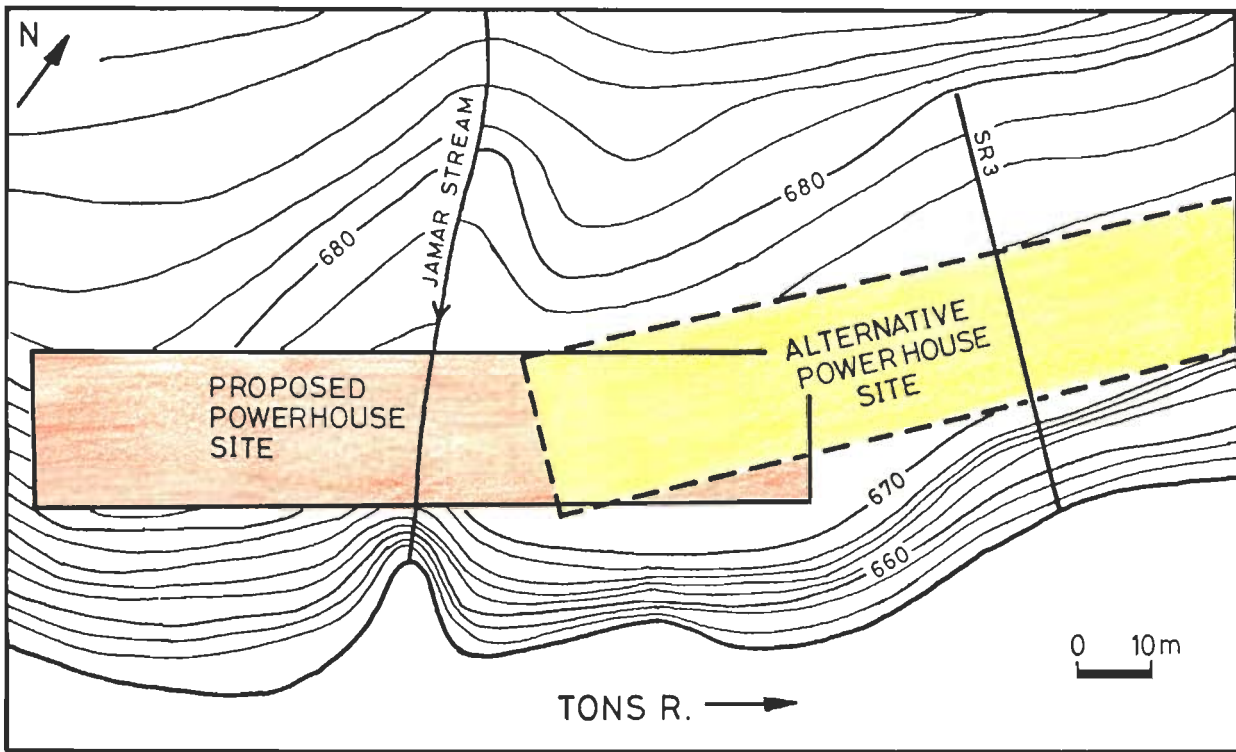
ALTERNATIVE POWERHOUSE SITE FOR KISHAU DAM.
